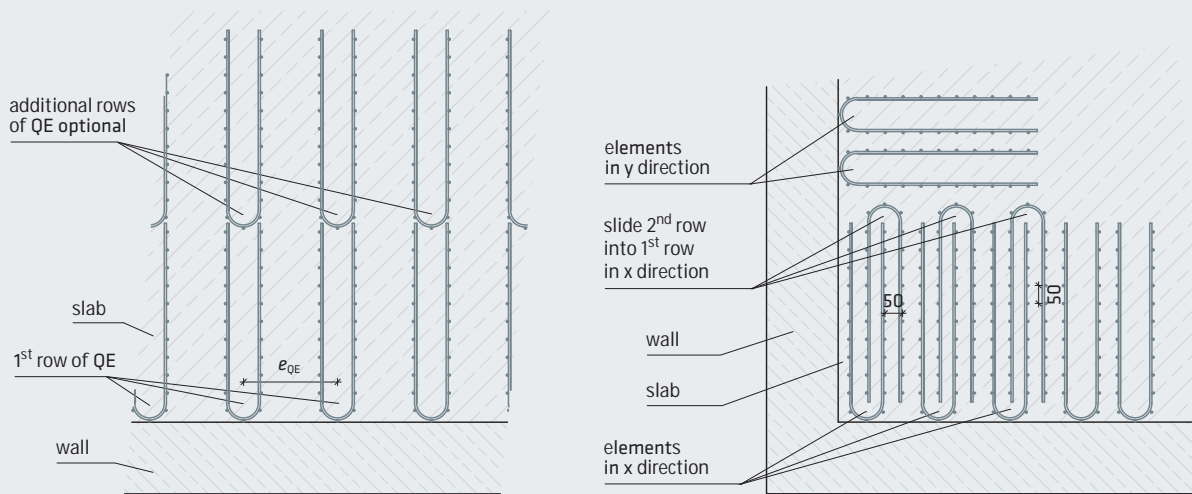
placement of shear elements QE, ground plan - portion of a slab (left) and corner of a slab (right)
